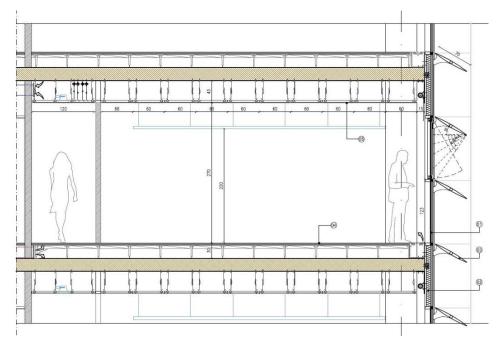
Architectural section showing the typical storey (dimension in cm), © Progetto CMR
